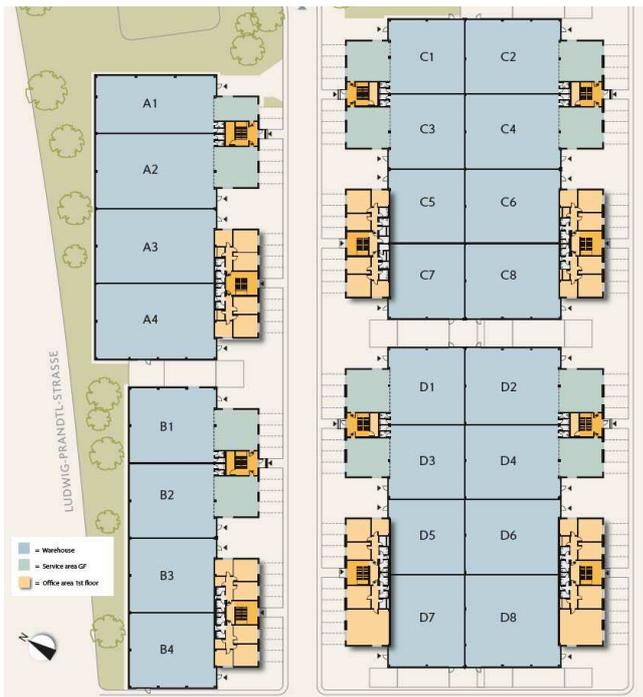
Floor plan of the SEGRO Service Park Berlin Airport, 1st construction stage (Source: SEGRO)
